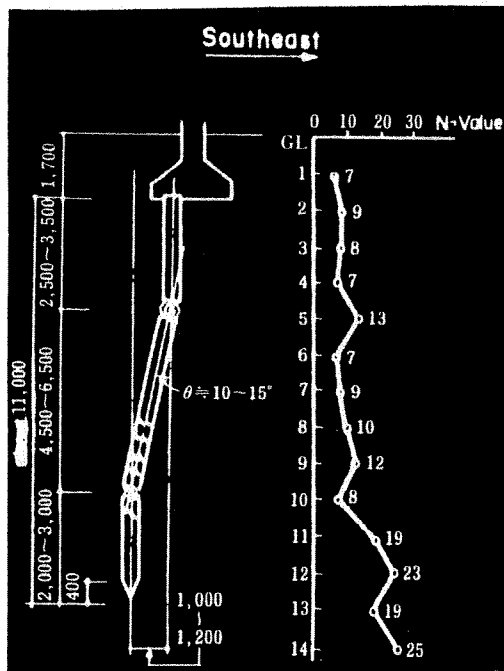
Schematic drawing of the damaged pile and N-values of the surrounding soil.
